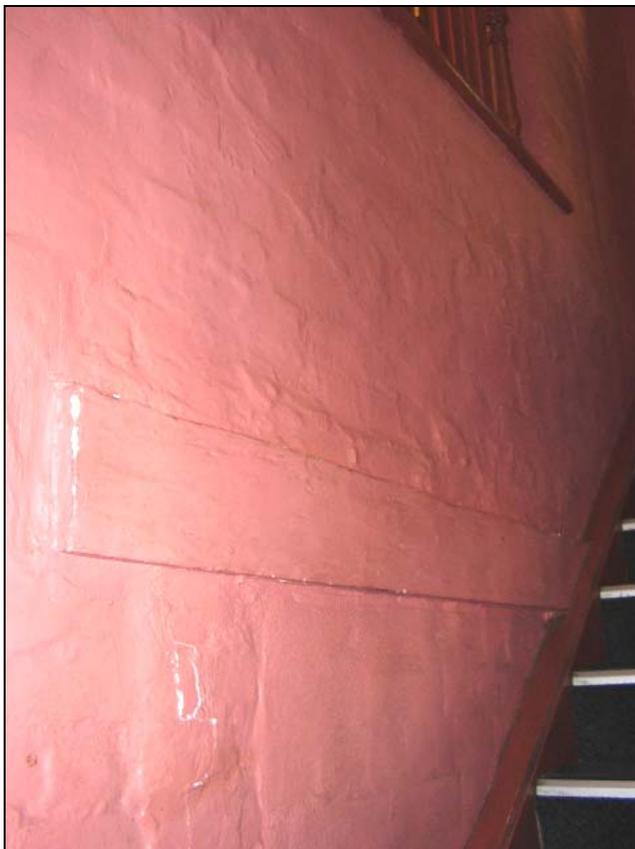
The cross wall in No. 13 retains evidence of an opening formed as part of the 1970s works. The opening was infilled when the stair was reinstated as part of the 1990s works.
